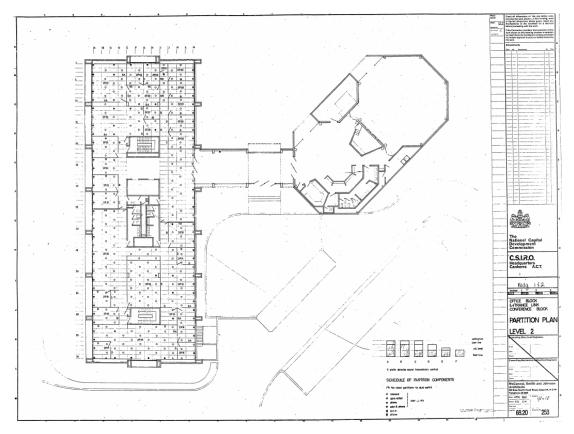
Original architectural drawings of Level 2 (main floor) of Buildings 1 and 2, with the varying timber and glazing components of the office partition walls (Source: DOMA Group)
